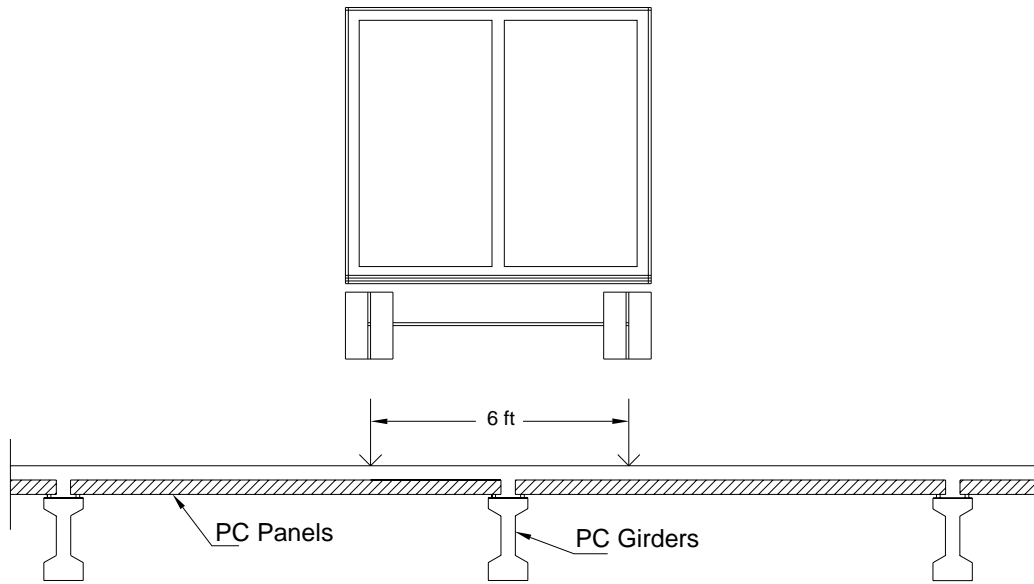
Transverse Cross Section of Typical Bridge Deck
